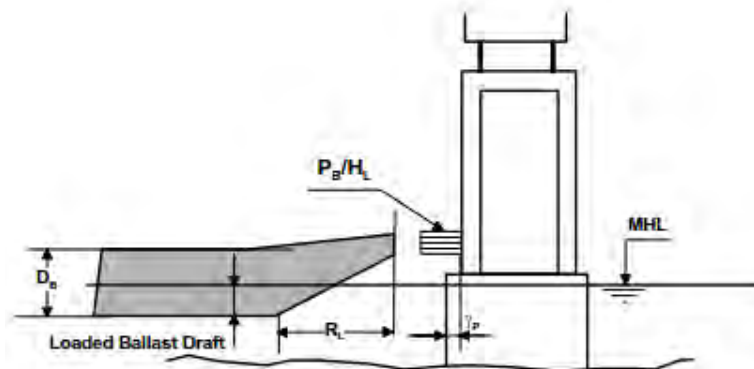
Barge impact force on pier (after AASHTO 2014).
